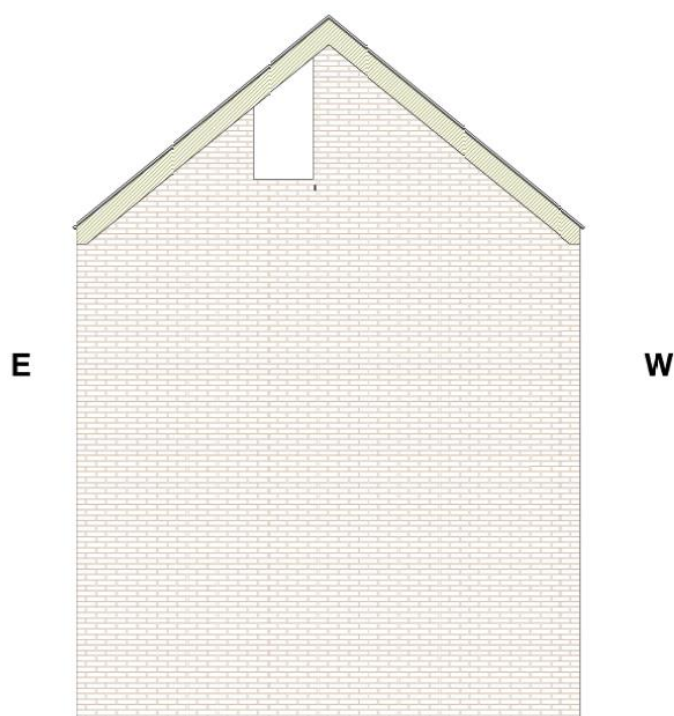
EQ-NPR 50% cracks – North clay façade.
